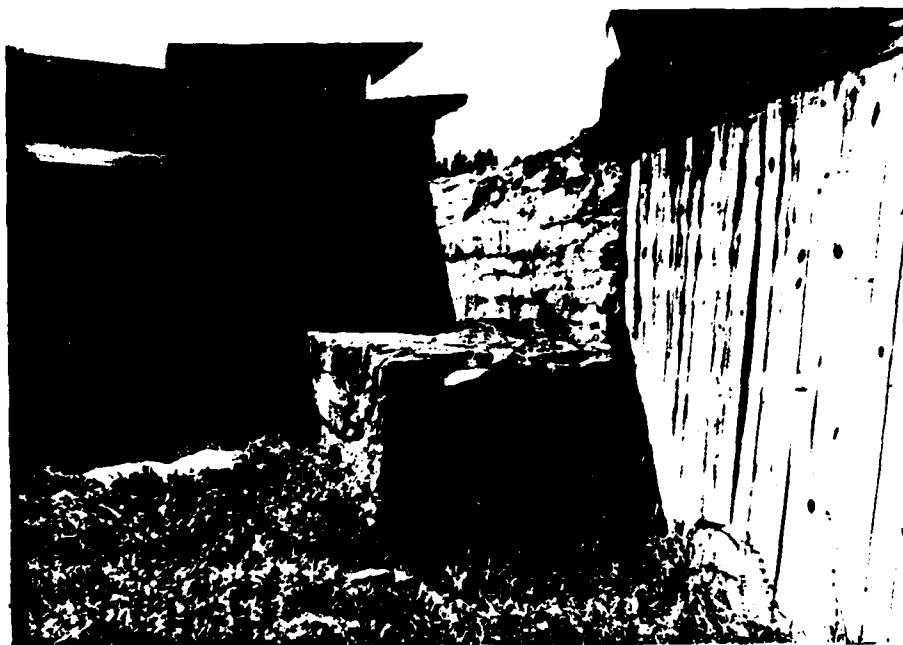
Concrete retaining wall of left embankment (Sept 1979)
